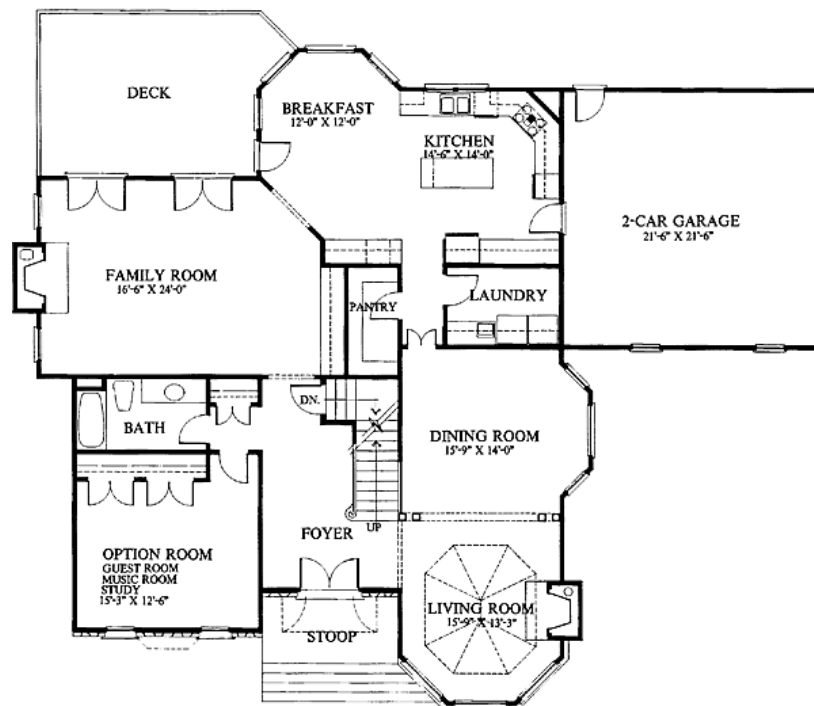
First Floor Plan (www.dreamhomes.com)
